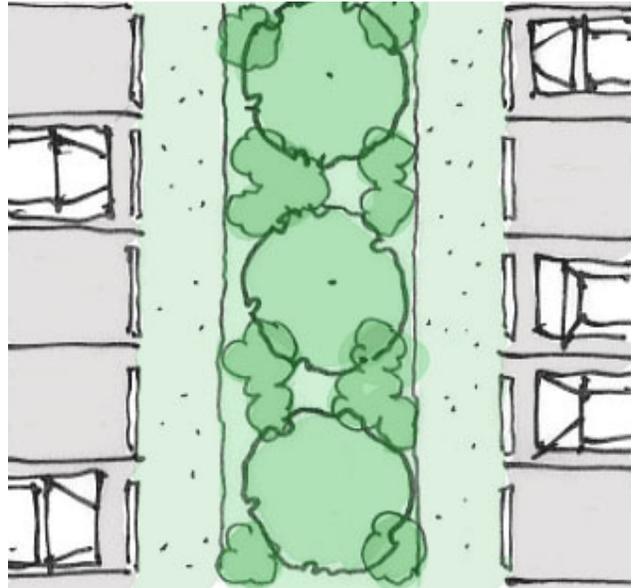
d.4 (1): A range of required parking lot landscaping as a site amenity
